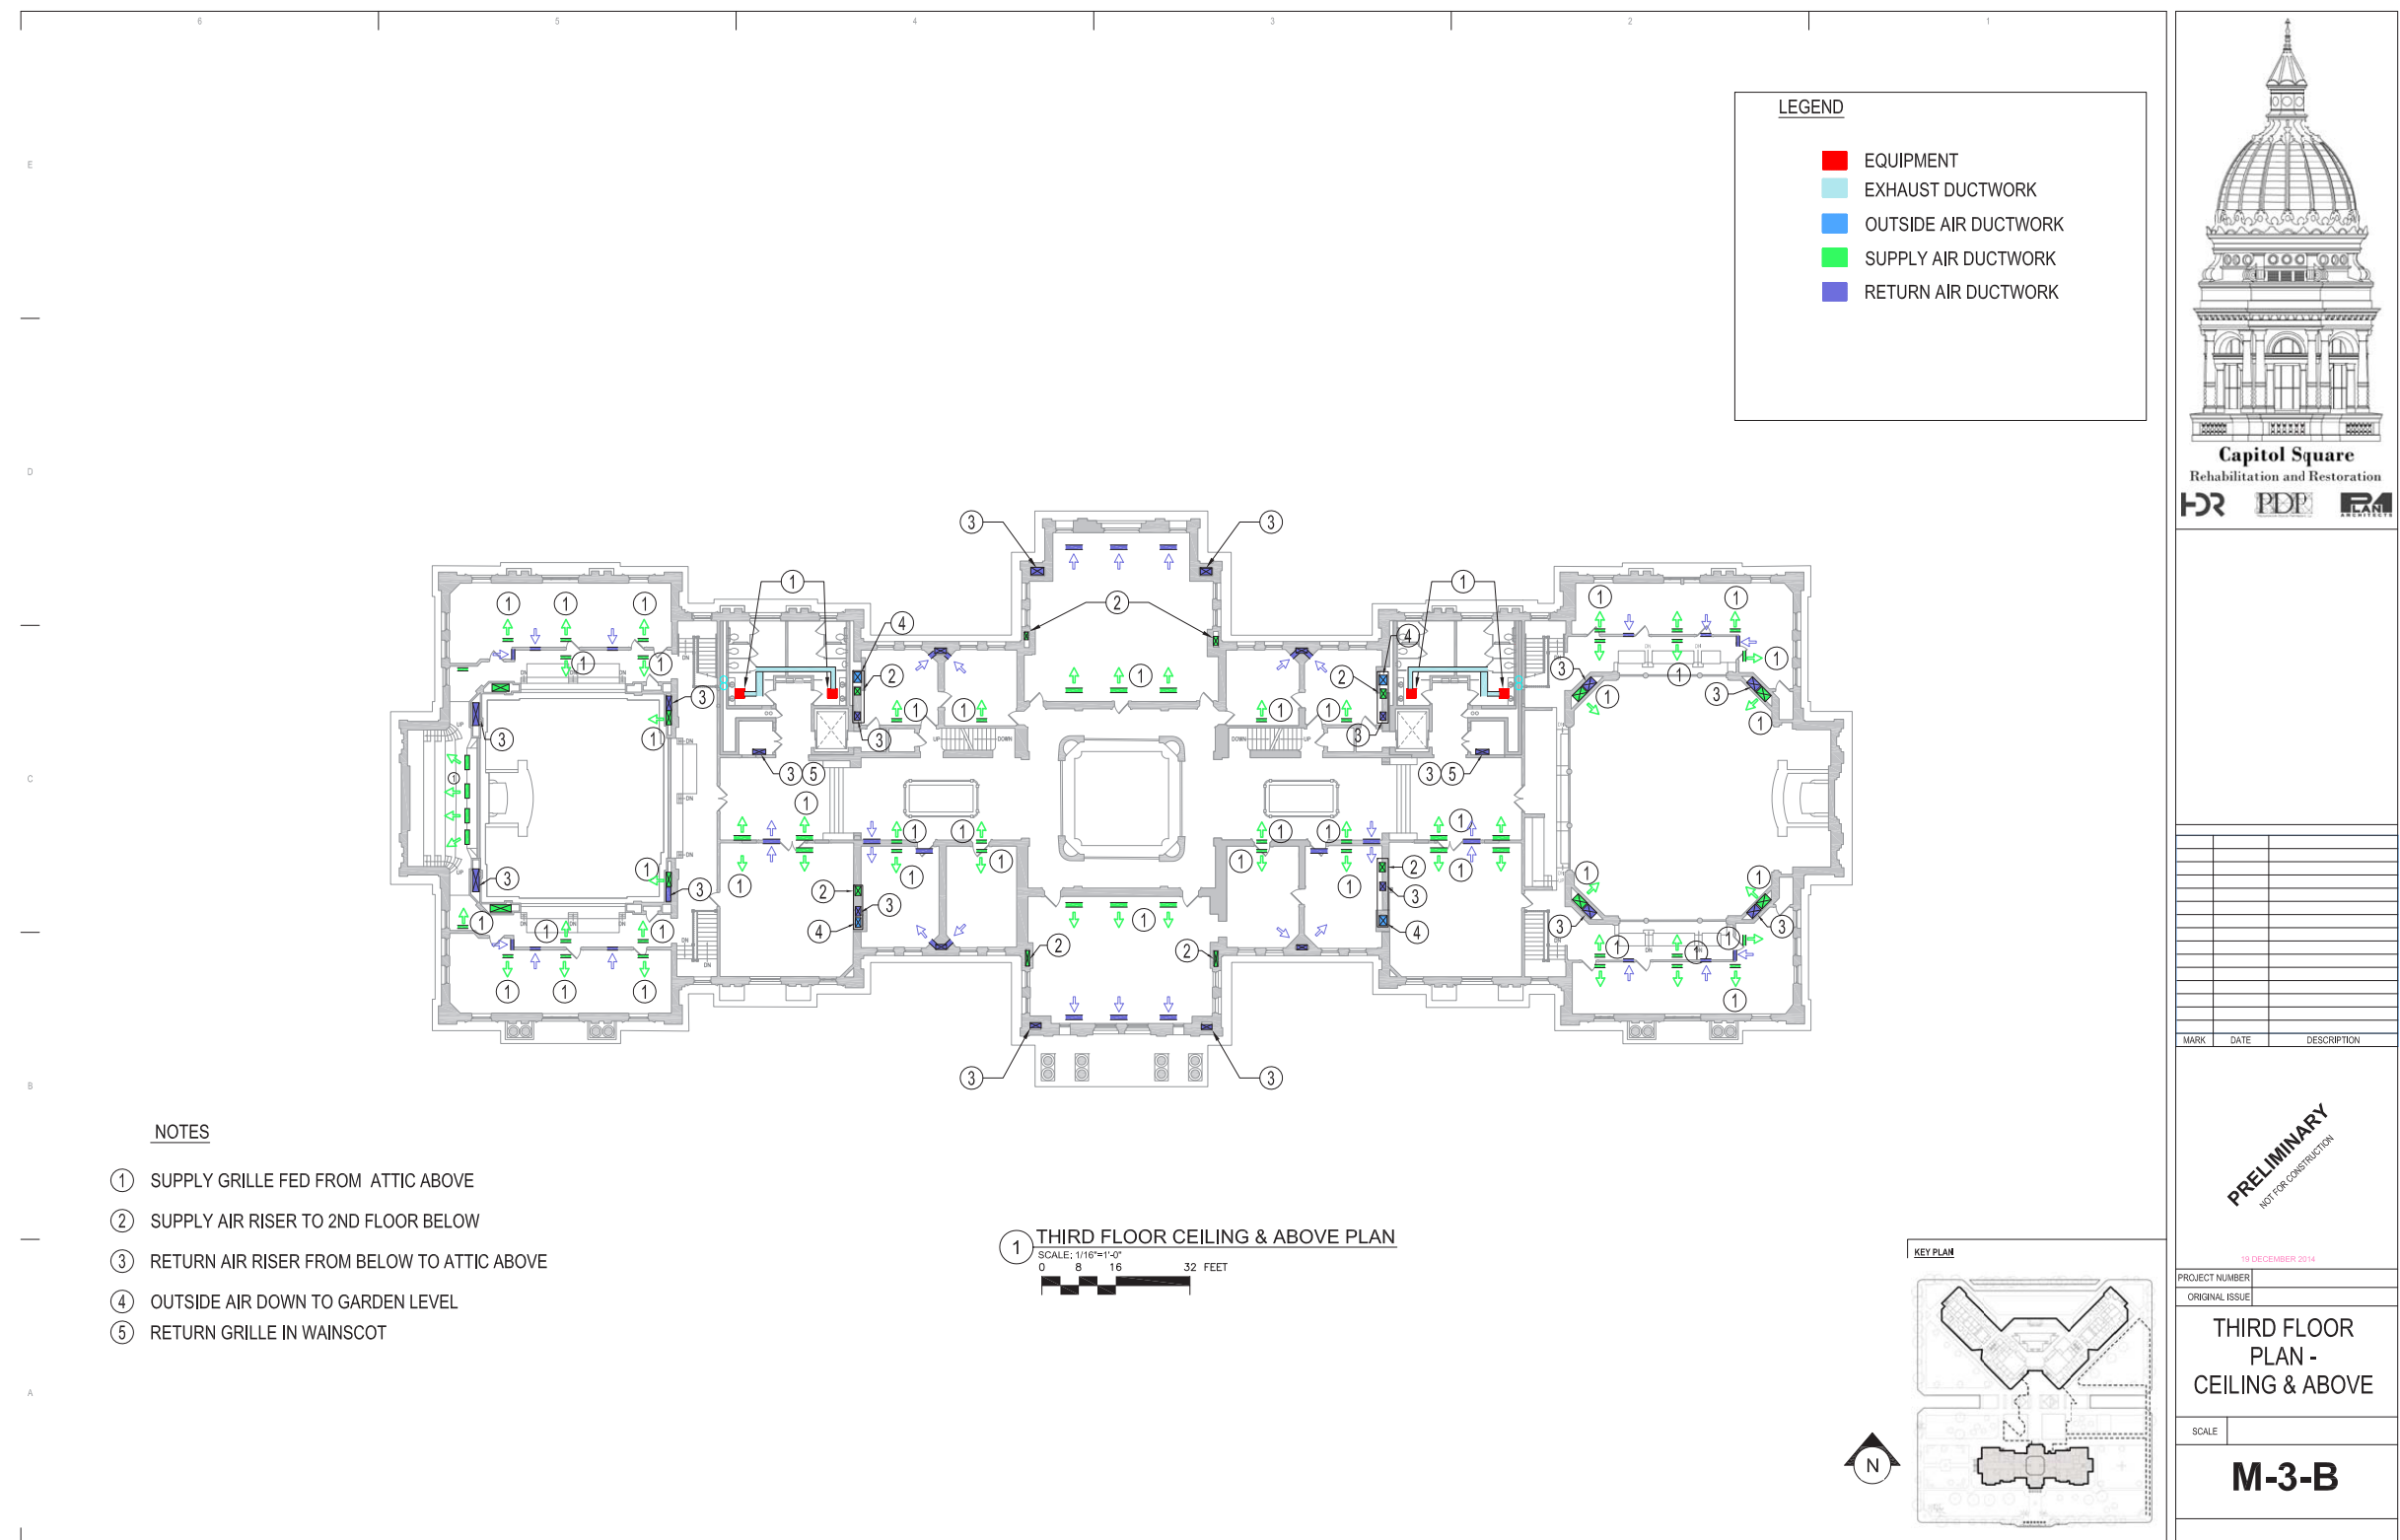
Third Floor HVAC Ceiling and Above Plan
